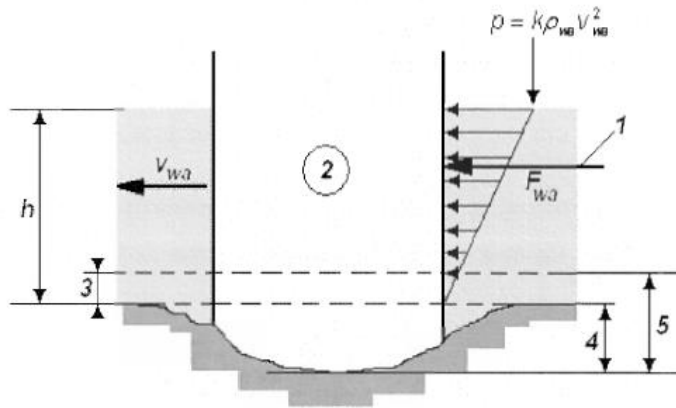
PRESSURE AND FORCE DUE TO CURRENTS ON BRIDGE PIERS [25]
